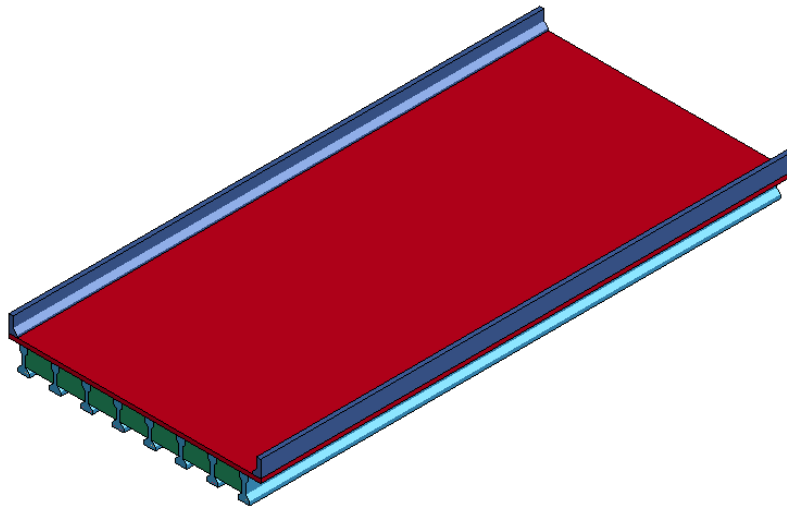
3-D View of Archetype 3 Bridge Model.
